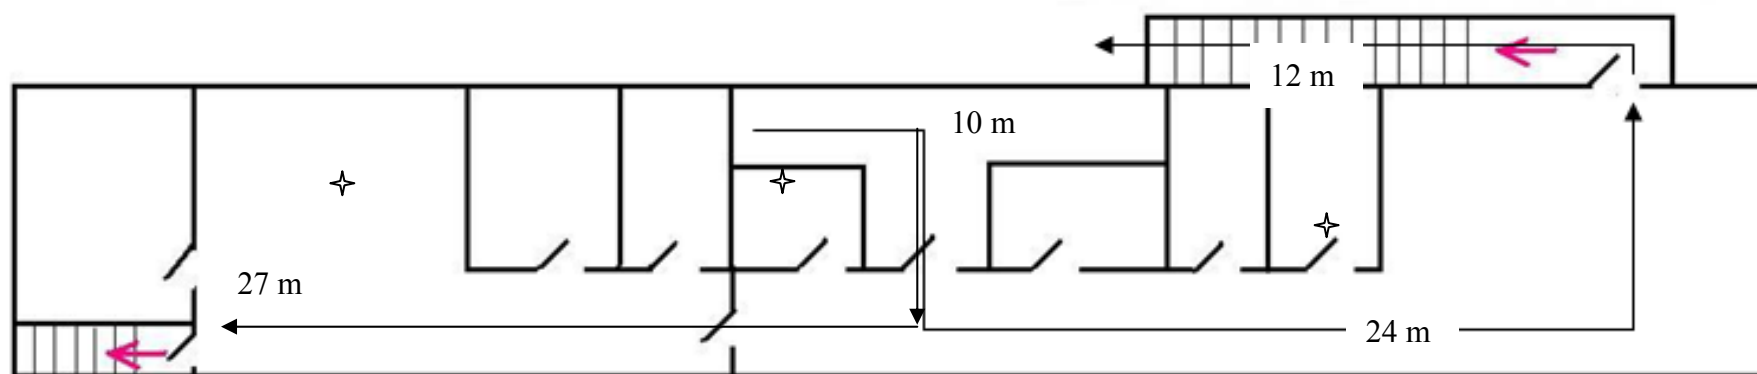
Fire rated wall, exits and egress routes on ground floor
